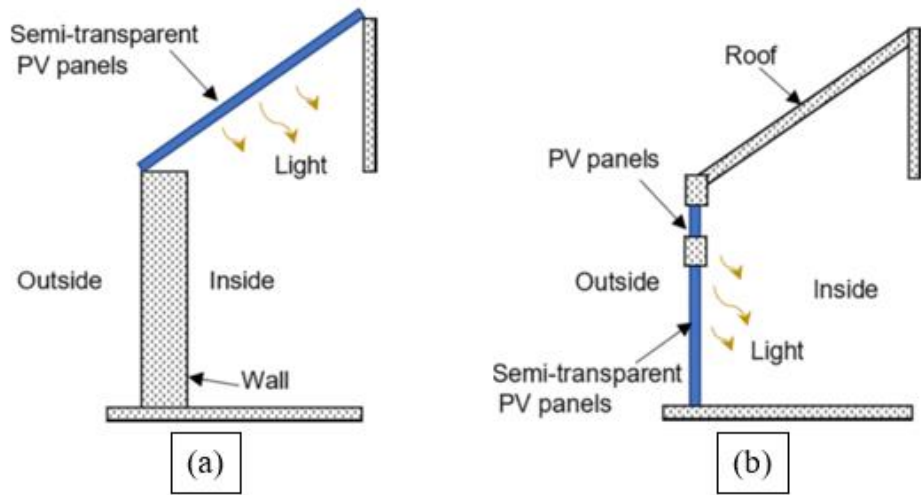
(a) BIPV semitransparent roof system with allowing sun light into the building. (b) Vertical BIPV system as semitransparent wall component or windows.
